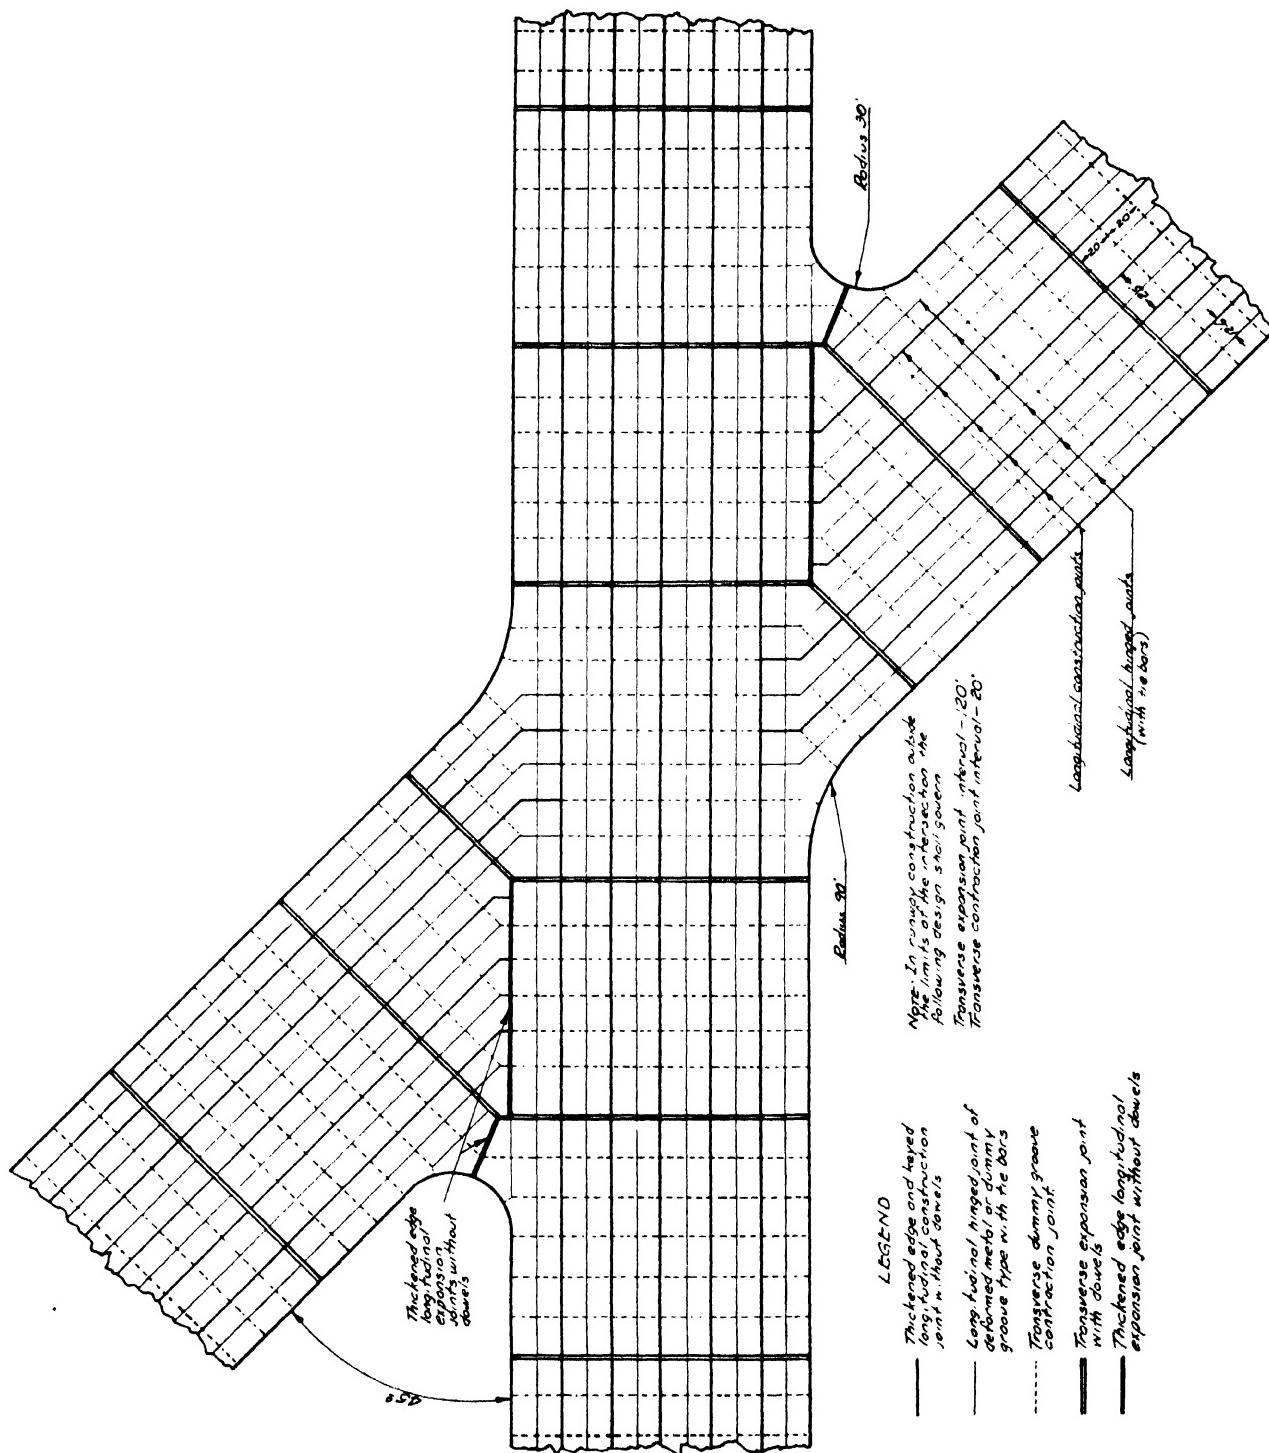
Typical plan for jointing at intersection of two airport runways intersecting at angle of 45° . Each runway 150 feet wide.
